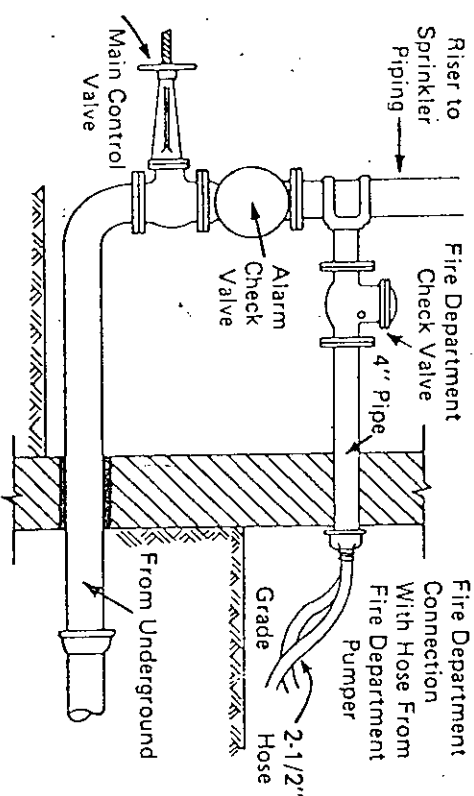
, 5(c). The fire department connection is generally arranged so that water can be pumped to the sprinklers even though the main sprinkler control valve and sprinkler shutoff valve happen to be closed. Also, the use of the fire department pump makes it possible to provide better pressures for the sprinklers than is normally available from a gravity tank or city main.
